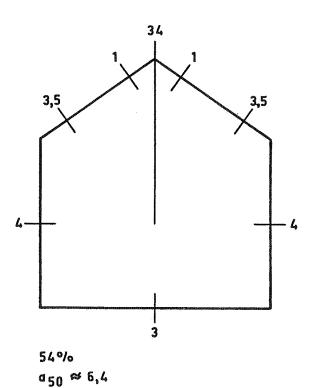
Realistic air leakage distribution after retrofitting floor and roof
